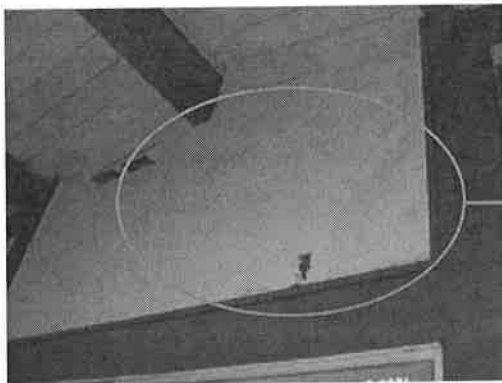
Exterior Plywood Cladding At East Elevation
